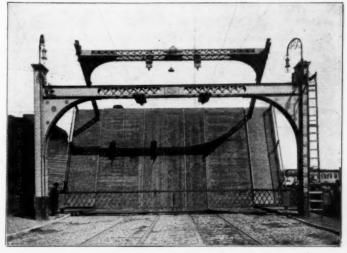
SCHERZER ROLLING LIFT BRIDGE AT UNION STREET, BROOK-LYN. ROADWAY BLOCKED AGAINST ACCIDENT
